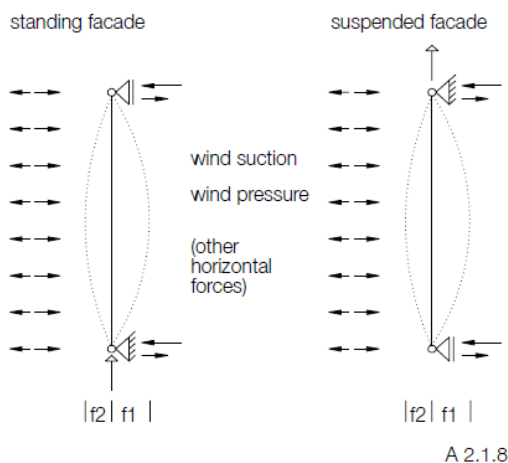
Standing and suspended façade (Herzog et al., 2021)
